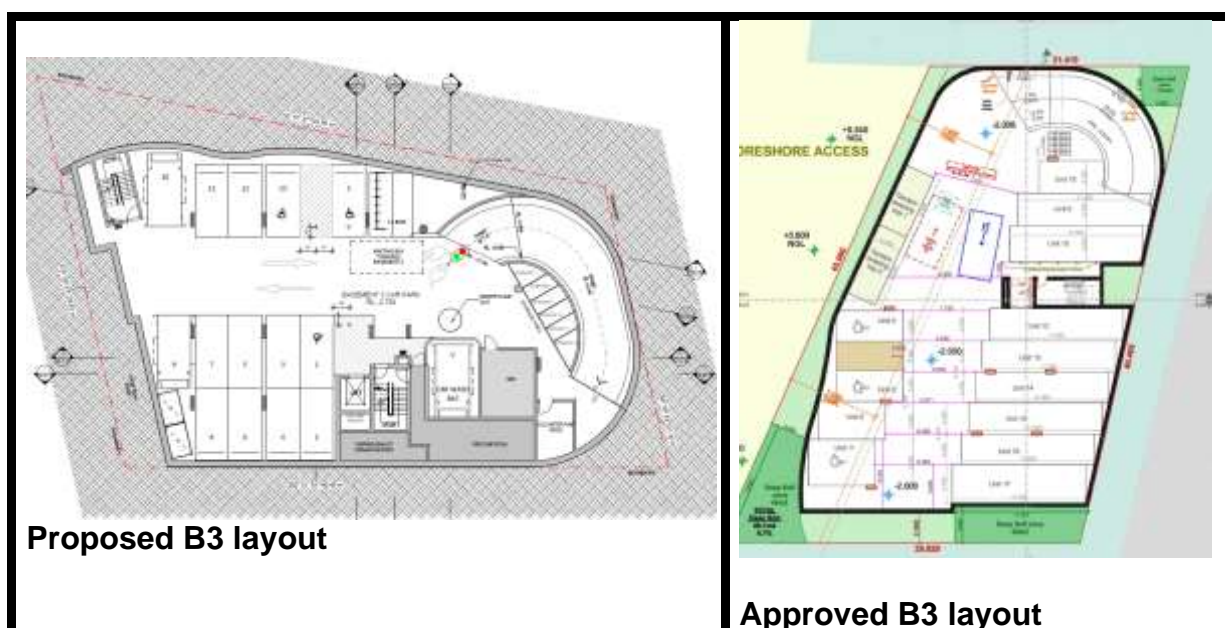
Comparison of the two (2) basement plan layouts the approved scheme (right) and modified scheme (left)
